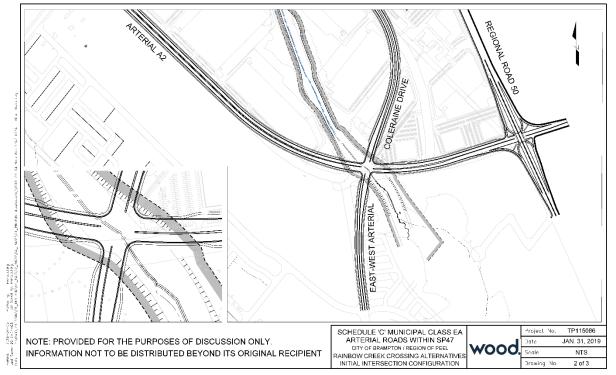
Roadway Design Alternative 1 - Intersection Within the NHS
